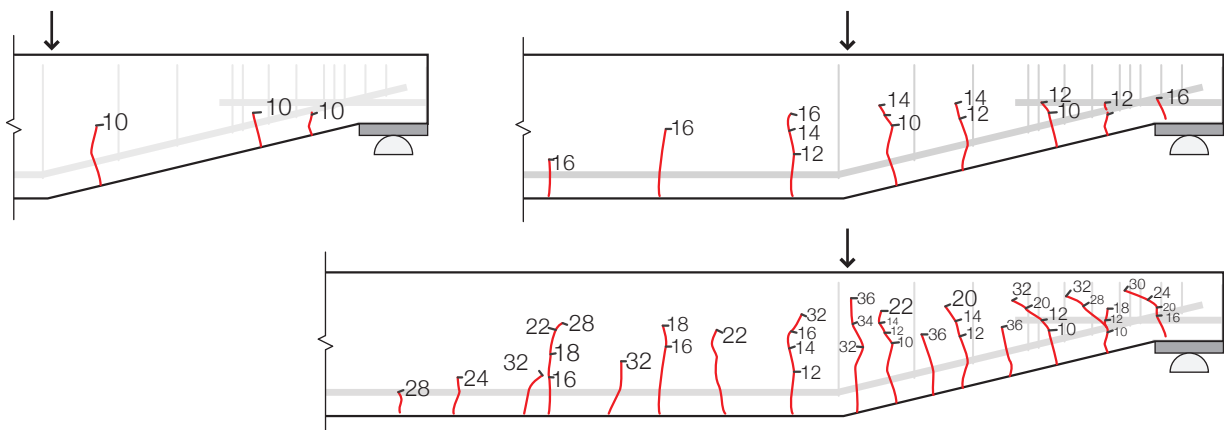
Cracking in Beam 9\_2\_STM\_2(ii).
